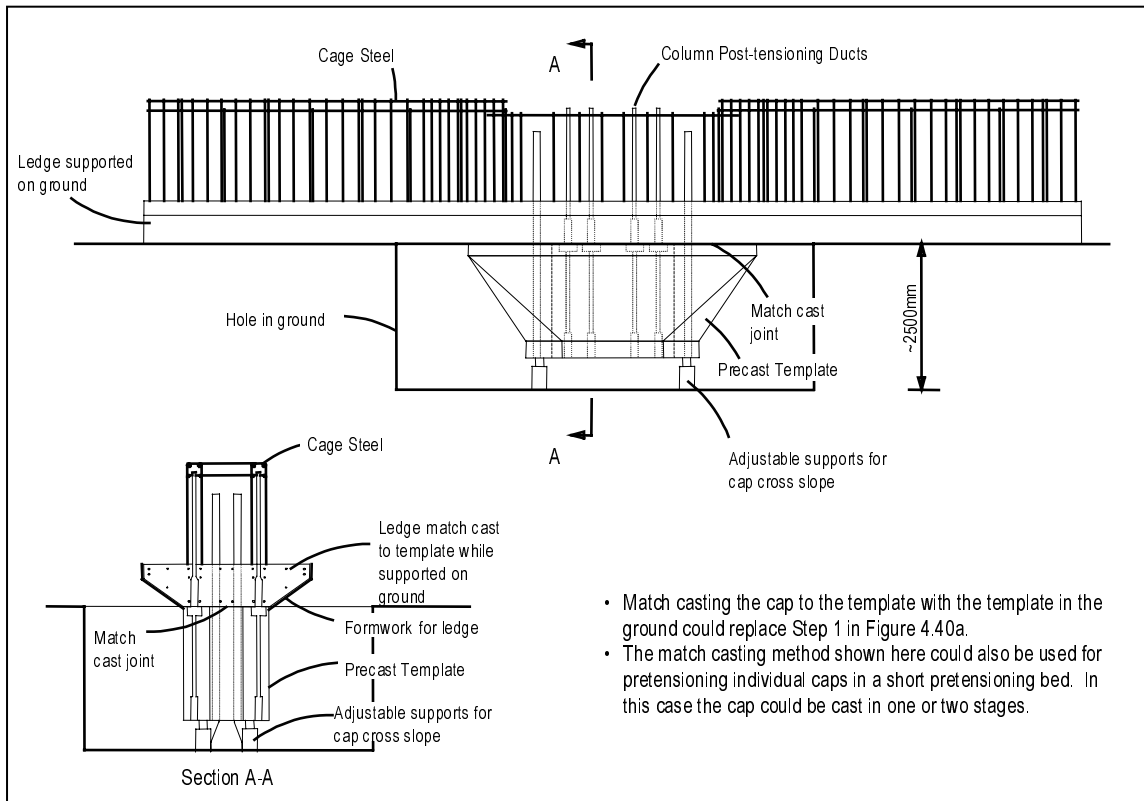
Two-stage match casting of precast caps with precast template in ground
